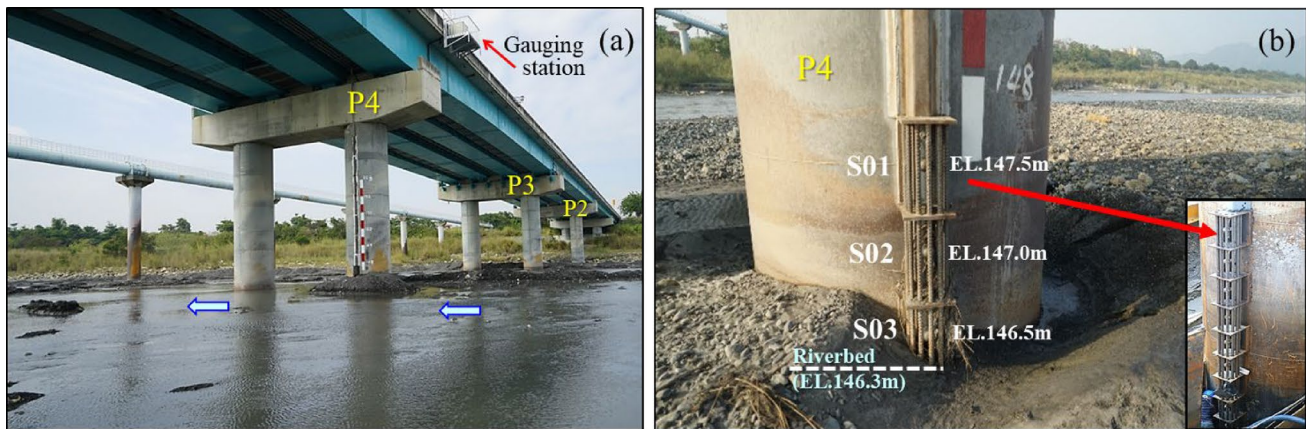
Field deployment of the scour monitoring system a viewing P4 of Mingchu Bridge from upstream; b installation on the pier and in situ inspection after Typhoon Megi flood
